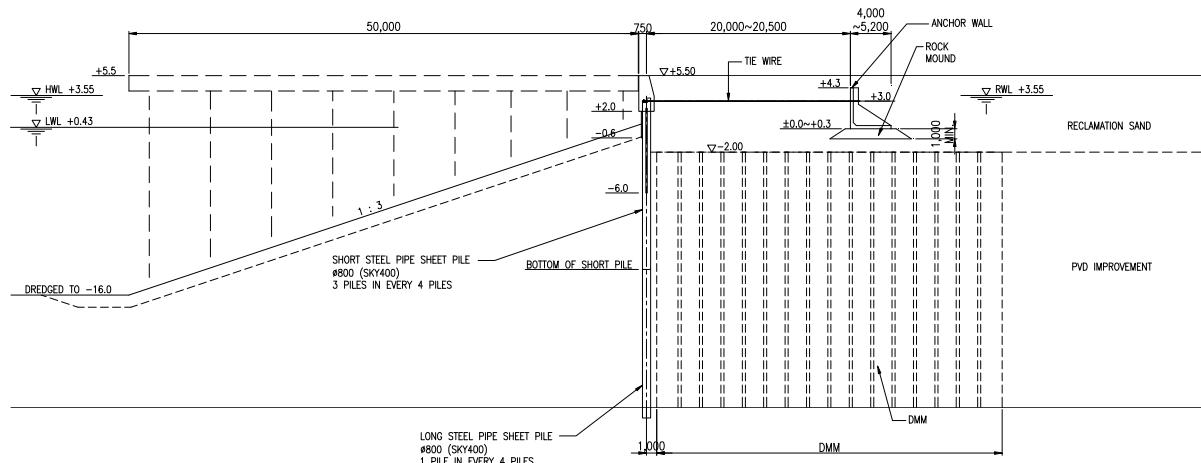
Determination of the Design Water Depth in front of Earth Retaining Wall
